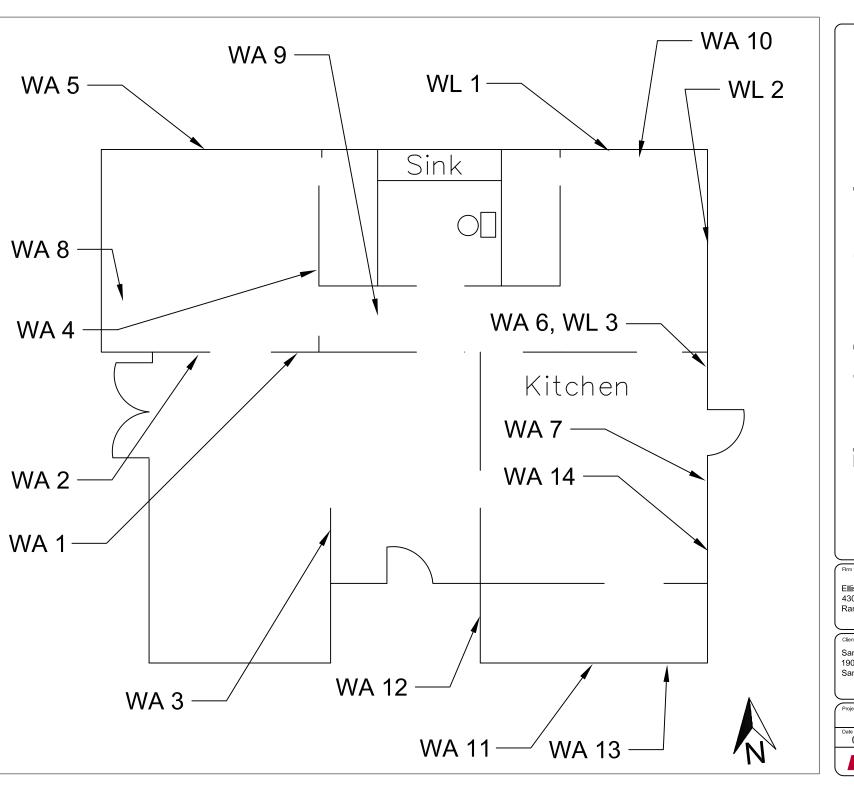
Sample Locations West House 2019 14th Street Santa Monica, CA 90405
